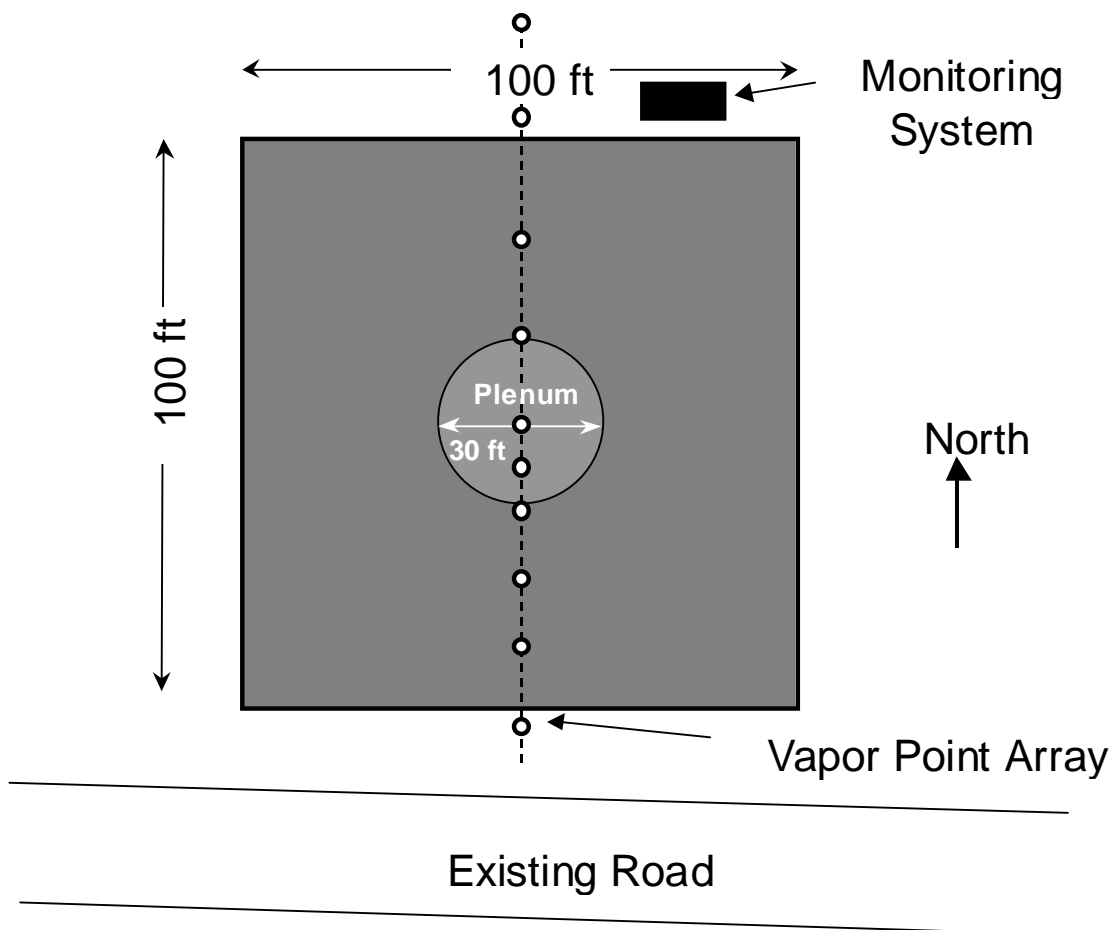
Plan view of BERT™ installation over RWMC Pit 2.
